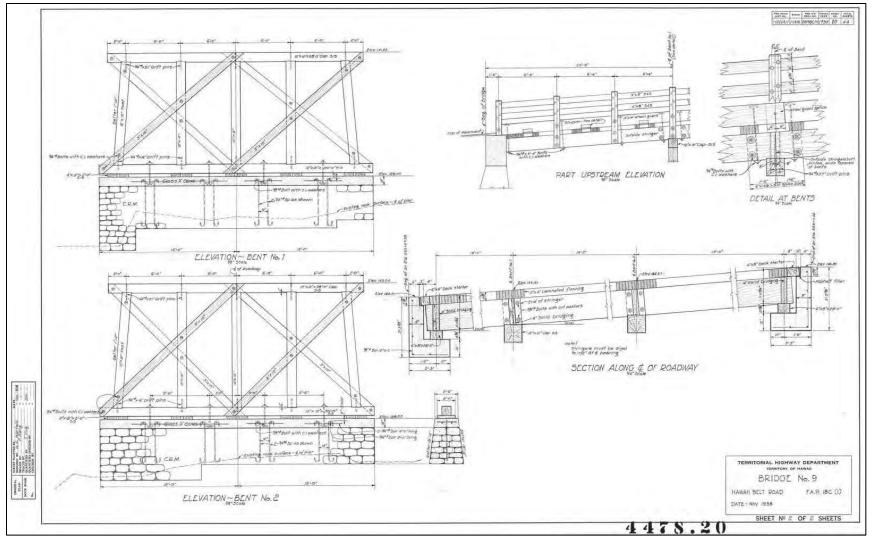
1938 Territory of Hawaii, Territorial Highway Department, Bridge No. 9 (Nīnole Bridge) plans sheet 2 of 2
